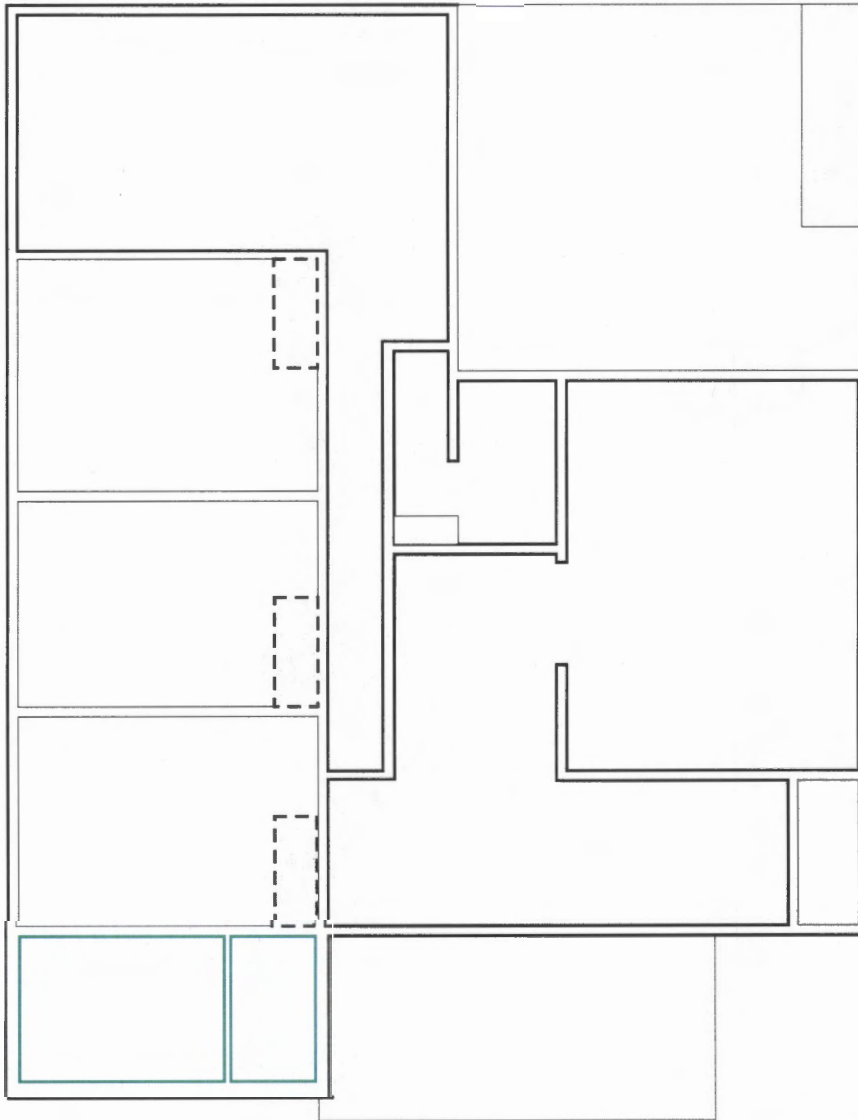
Plan view of existing house (black, with closets in darker shade), including part of wooden deck that will remain and carport (light gray outlined exterior parts) and addition to south (bottom of drawing). See variance application for maximum dimensions of the addition.
